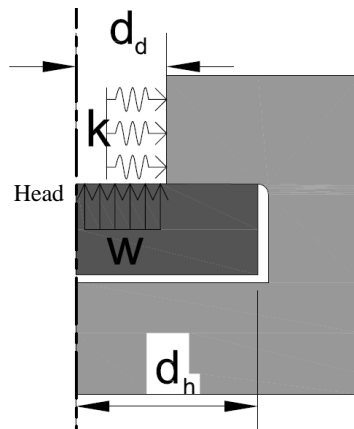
Detail of the anchor head (light grey– concrete, dark grey– steel).
